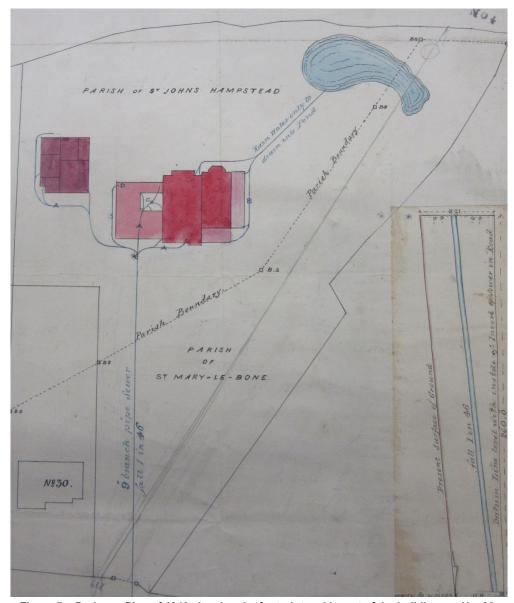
Drainage Plan of 1842 showing the footprint and layout of the buildings at No. 28.
